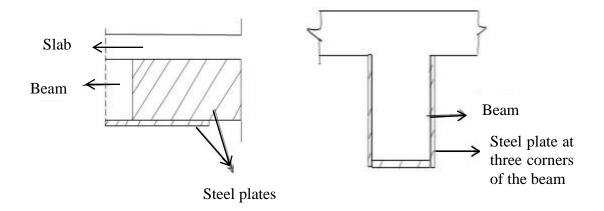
(c) Side view of steel plated beam (d) Cross section of three side plated flange beam.
